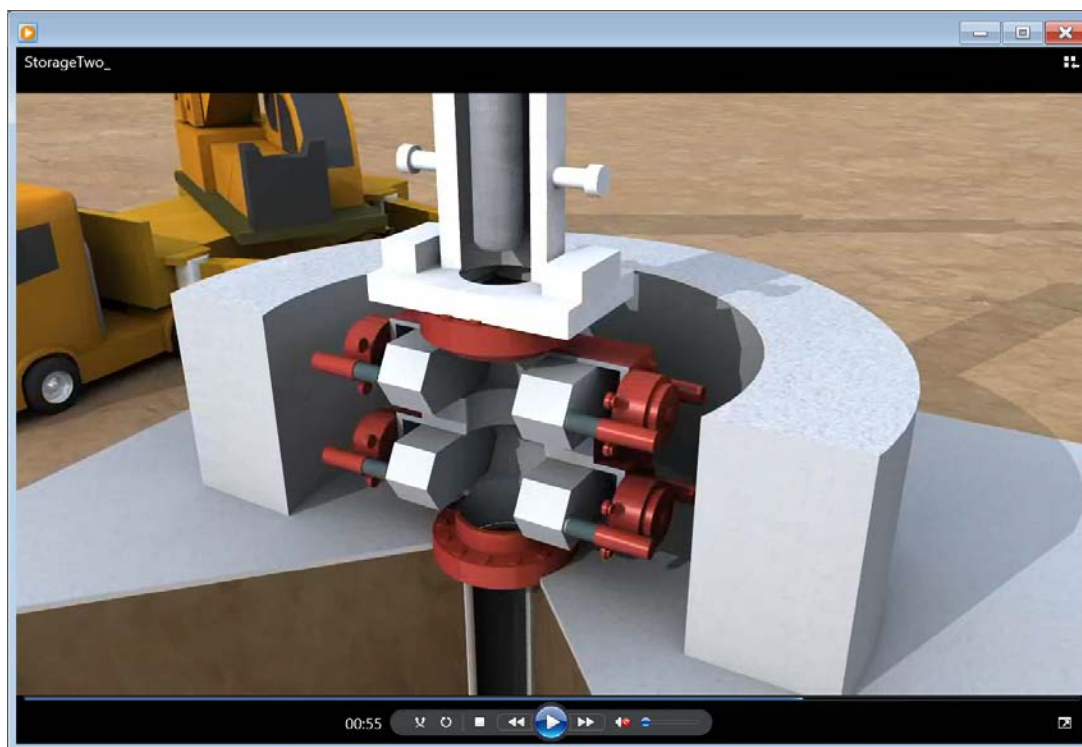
Detail of well head inside BOP shield, with doors opening in preparation for lowering waste package (mud handling equipment and headframe not shown).
